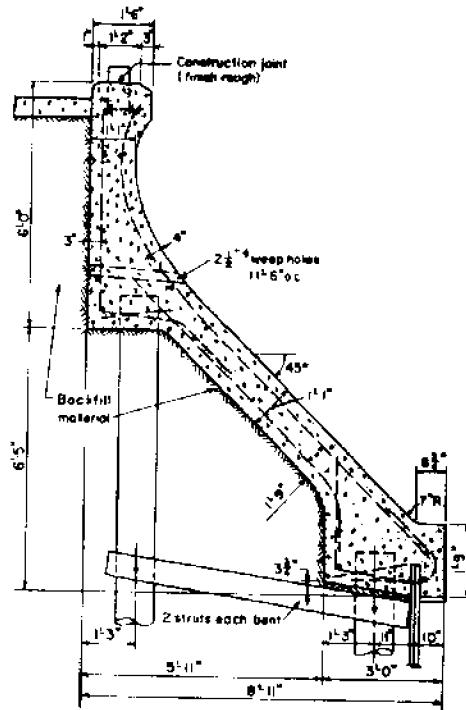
Section of Bayshore seawall, Tampa, Florida
